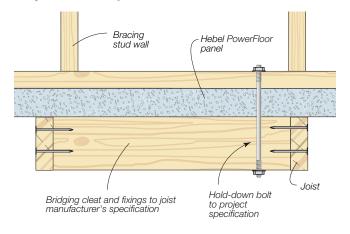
Hold-down of Internal Bracing Wall Perpendicular to Joists
